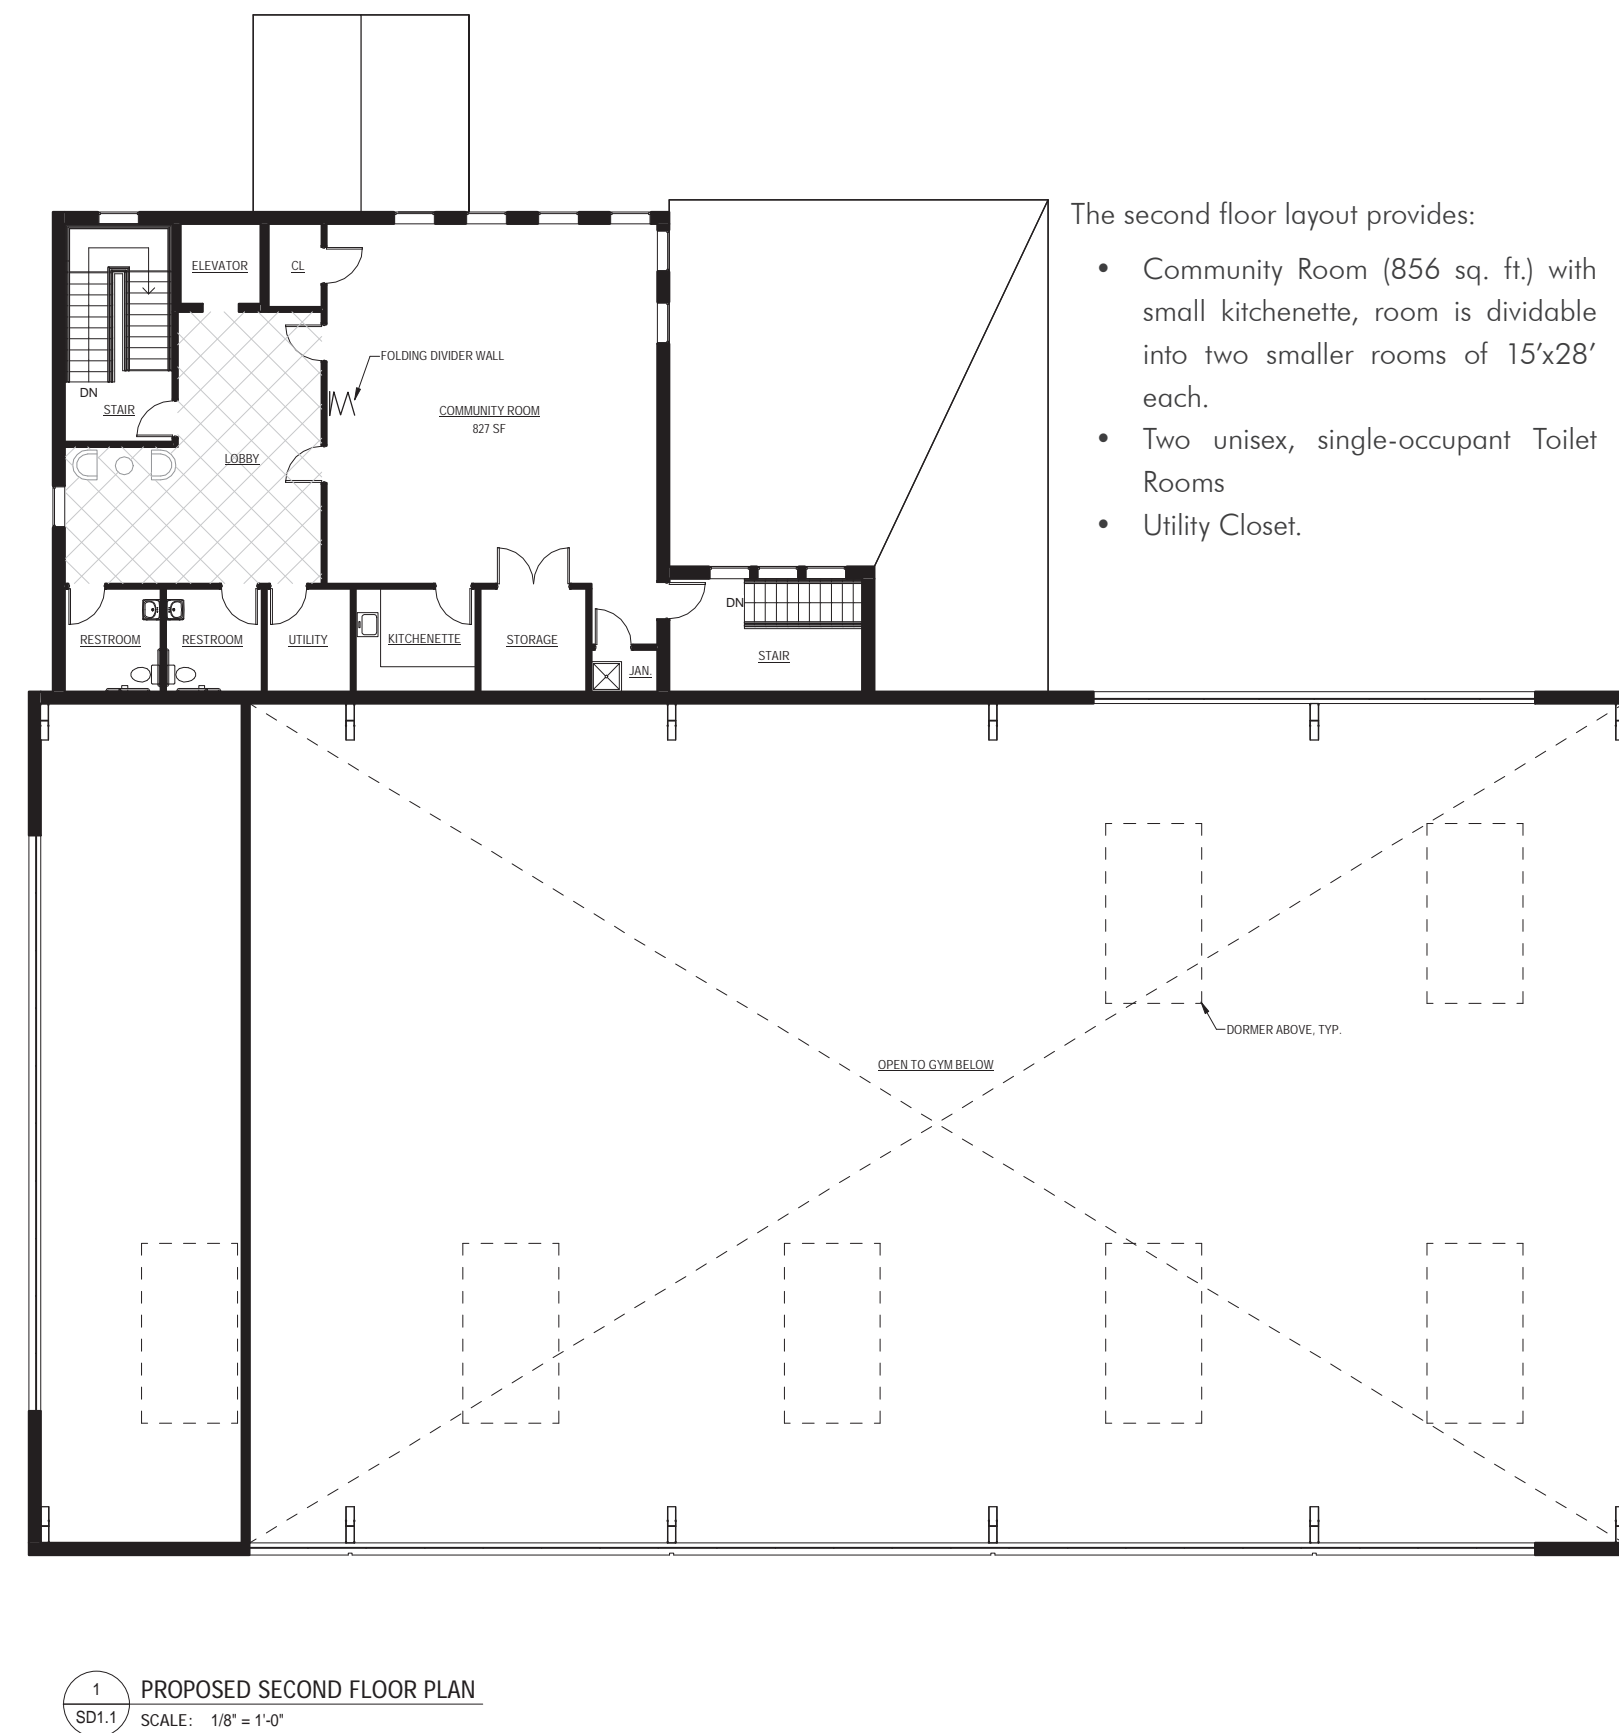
Neighborhood Recreation Building Second Floor Footprint
